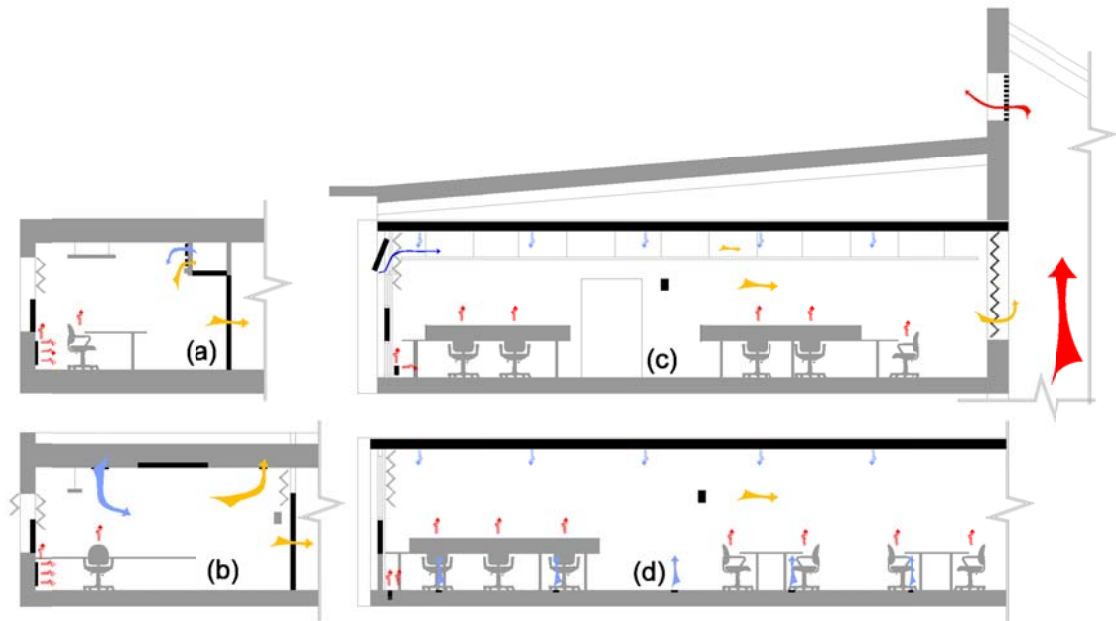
Winter day ventilation sections (a) Building A, (b) Building B, (c) Building C, and (d) Building D
